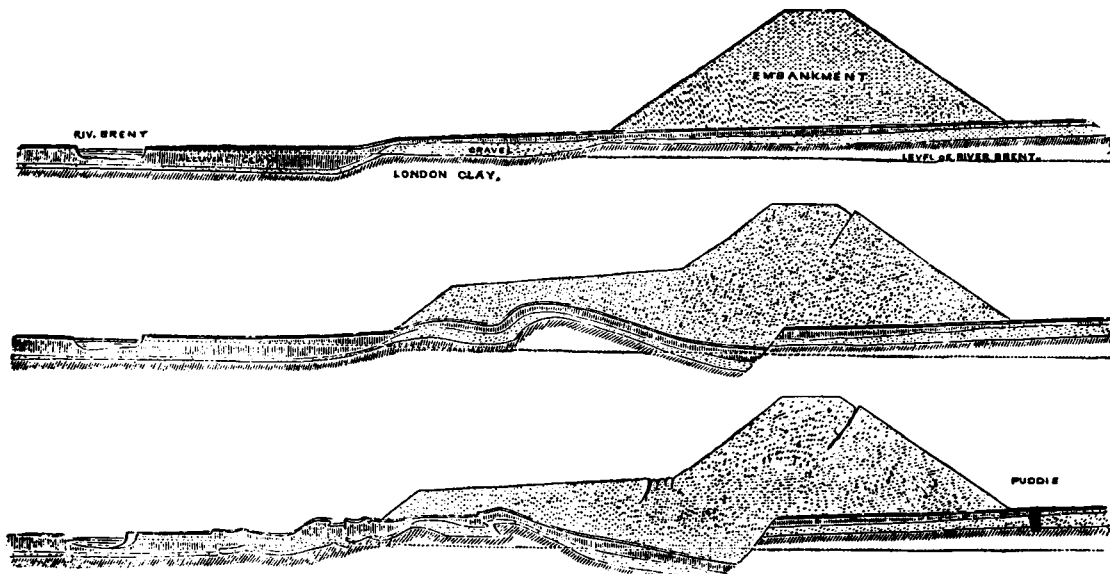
Brent embankment at Hanwell, Great Western Railway
